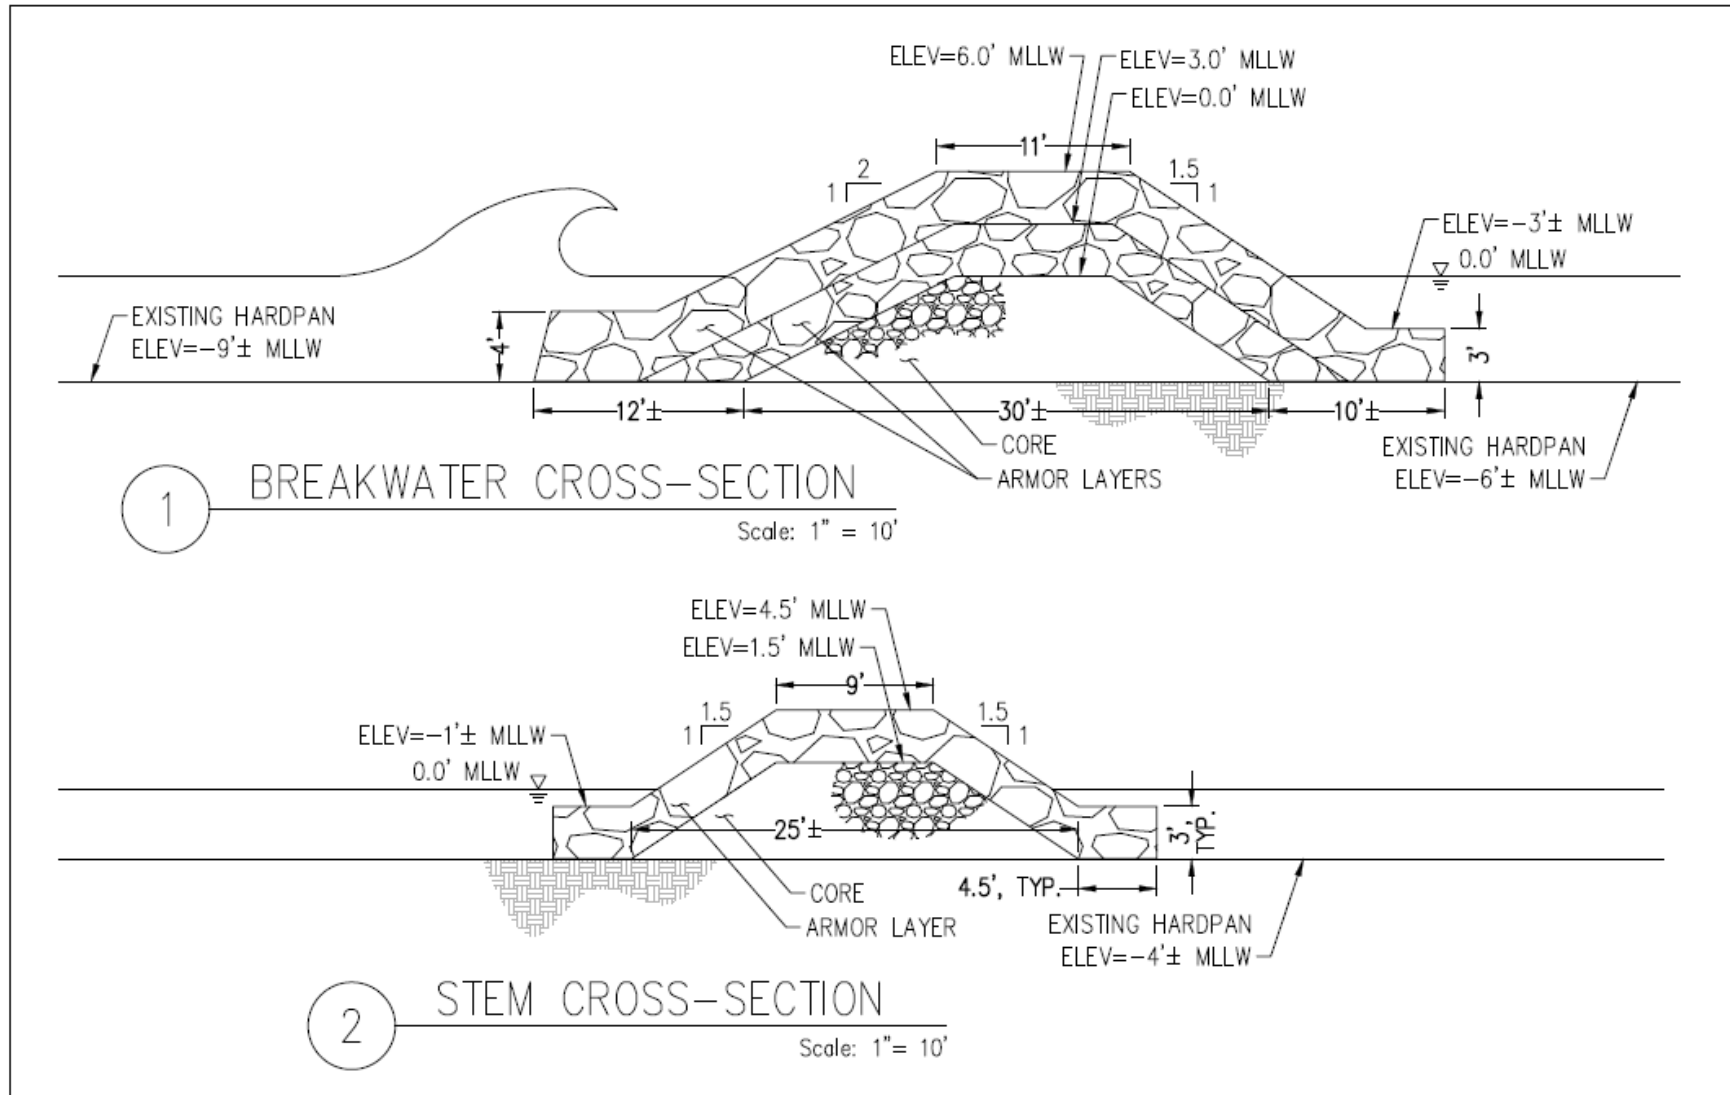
Typical Sections of Proposed Action: Beach Nourishment with Stabilizing Structures
